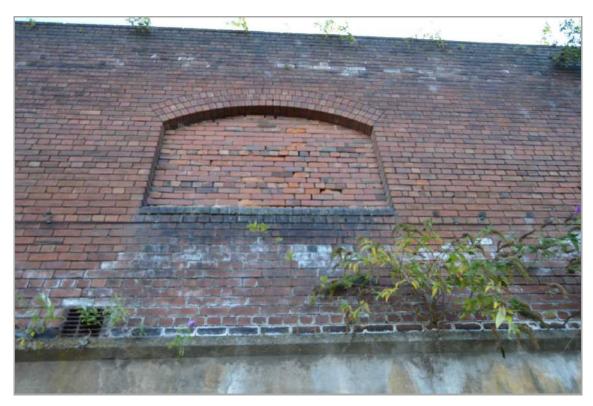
One of two large arched aperture, to north face of Structure 6 (facing south).
